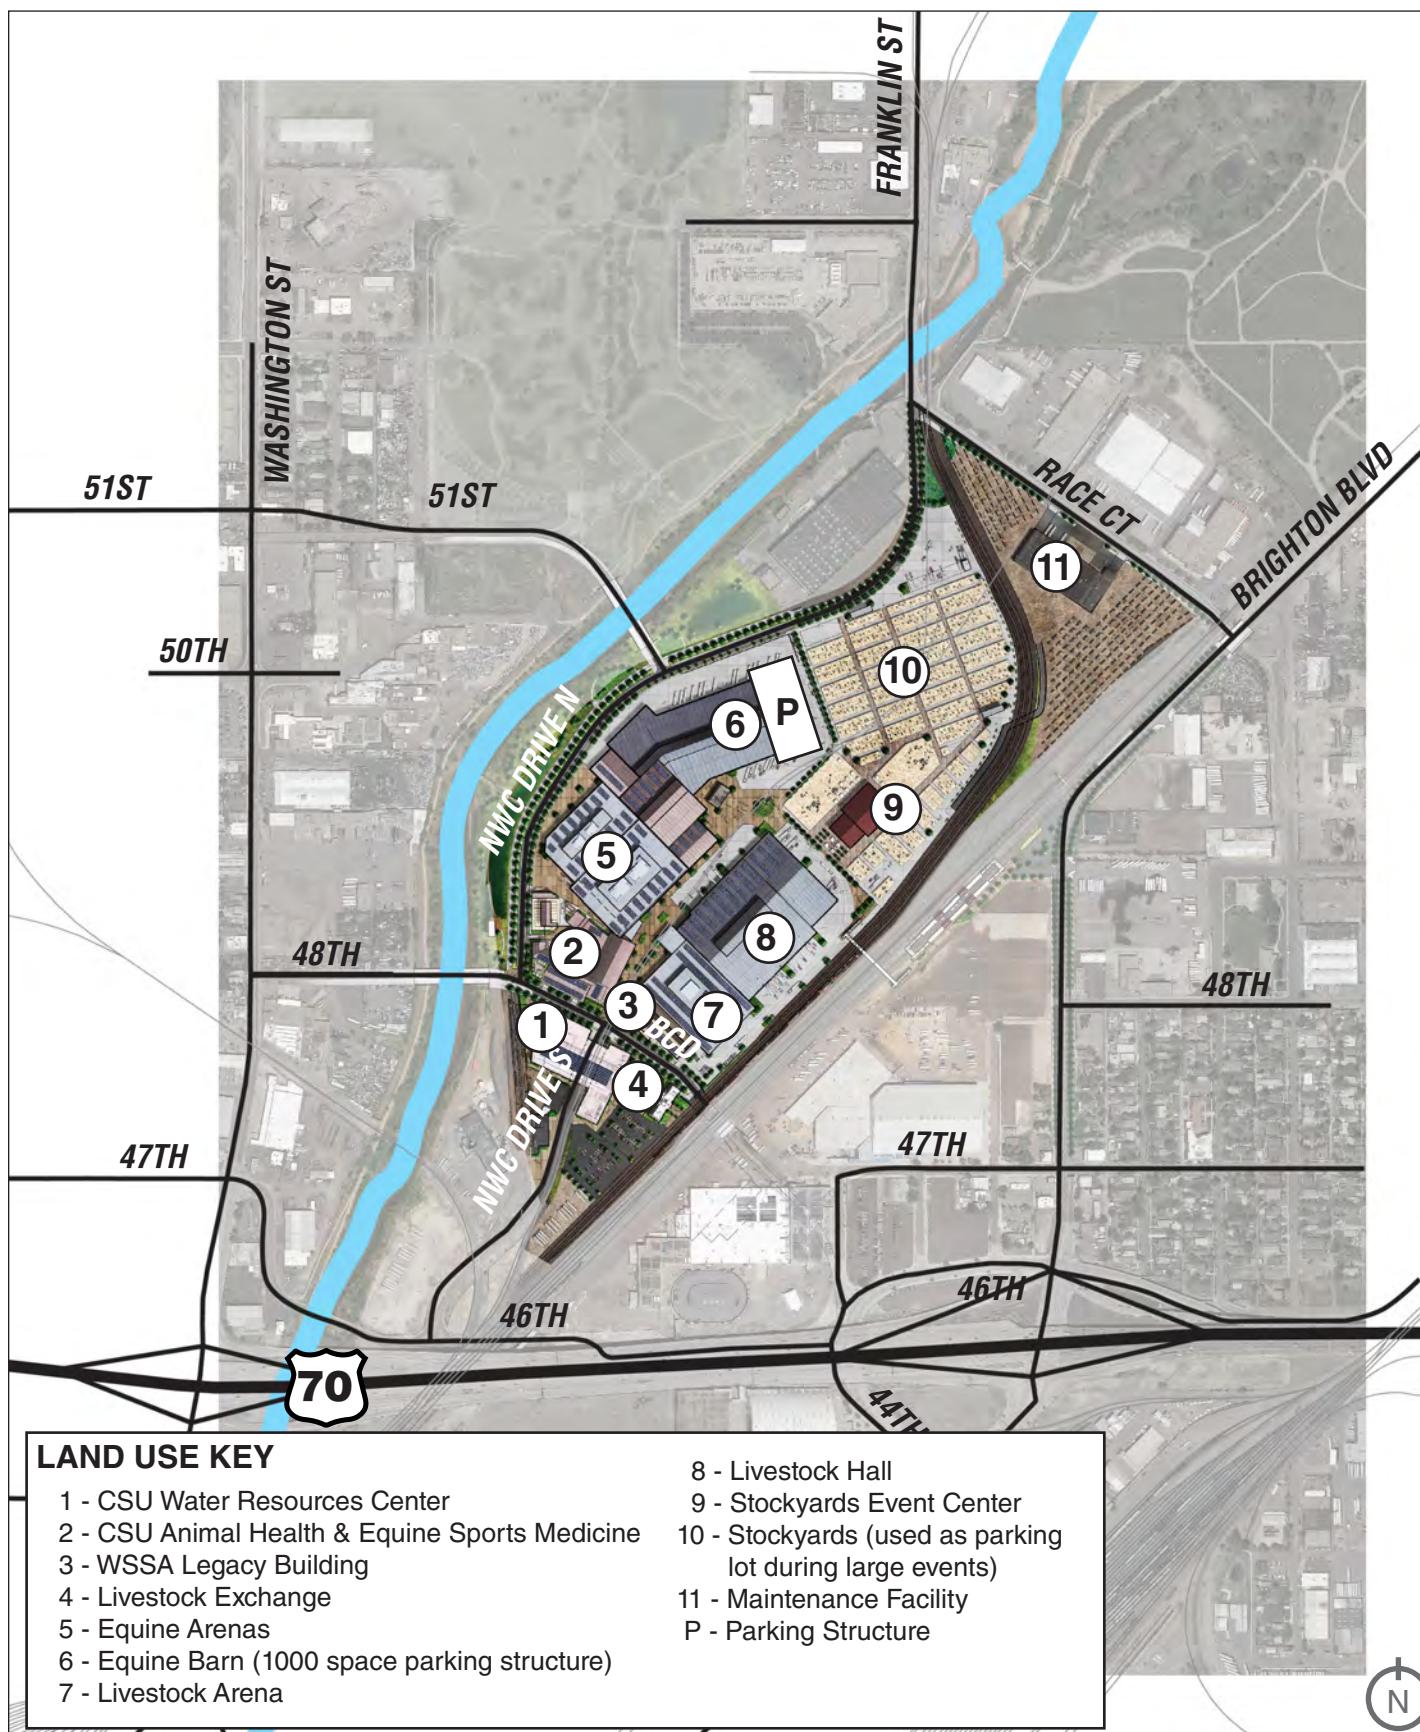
SITE LAYOUT | PHASE 1-2 AND FULL BUILD OUT
